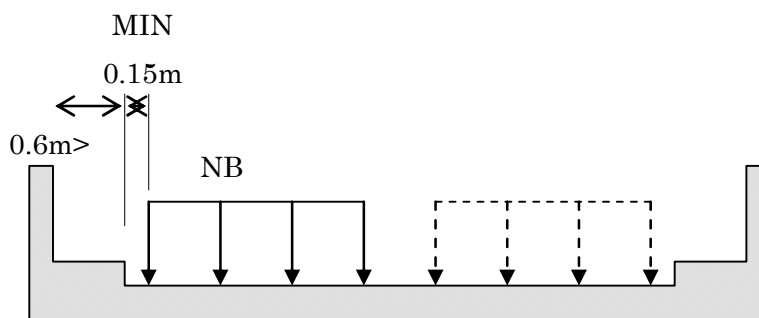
Wheel Load Arrangement and Load Intensity
